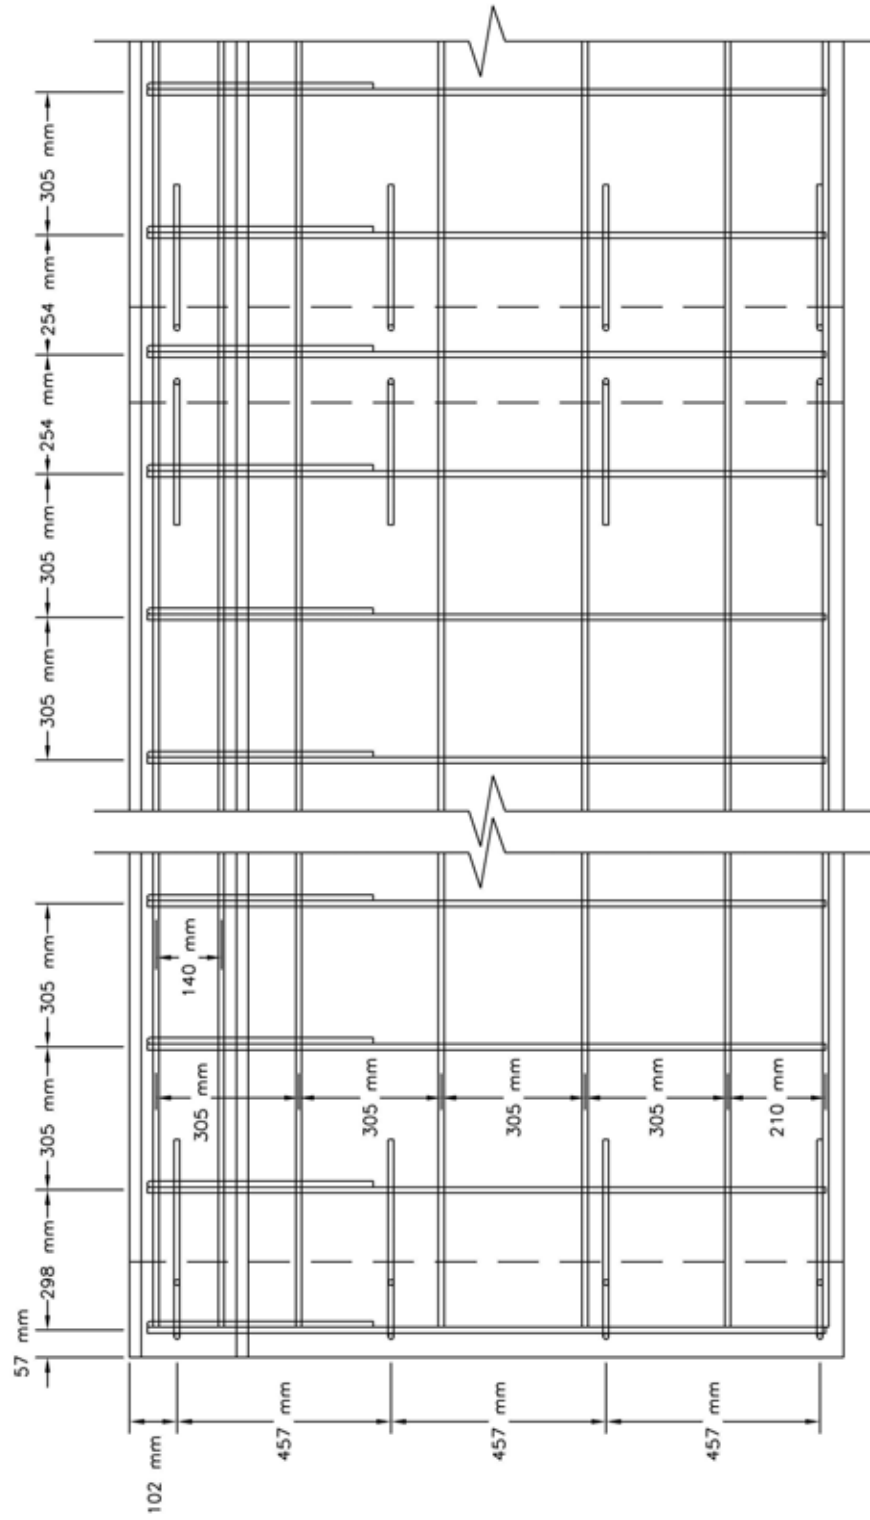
Concrete Culvert Top Slab and Curb Details - Plan View
